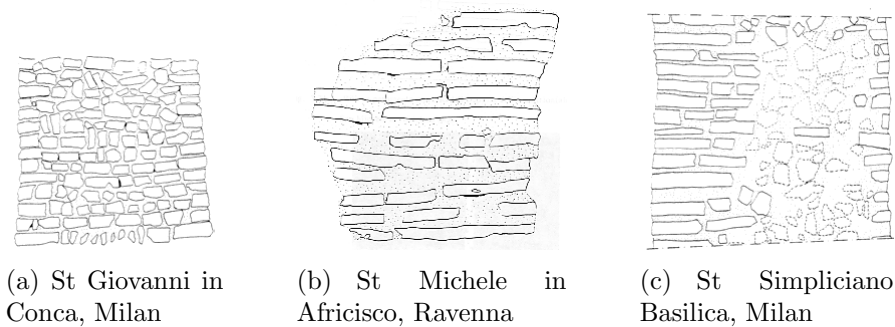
Examples of brick masonry section Binda and Saisi (2002).
